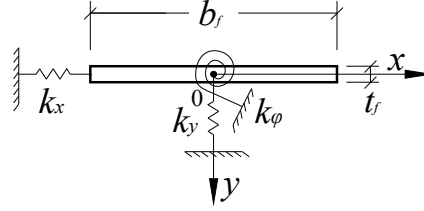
Simplified calculation model of I-steel concrete composite beams
